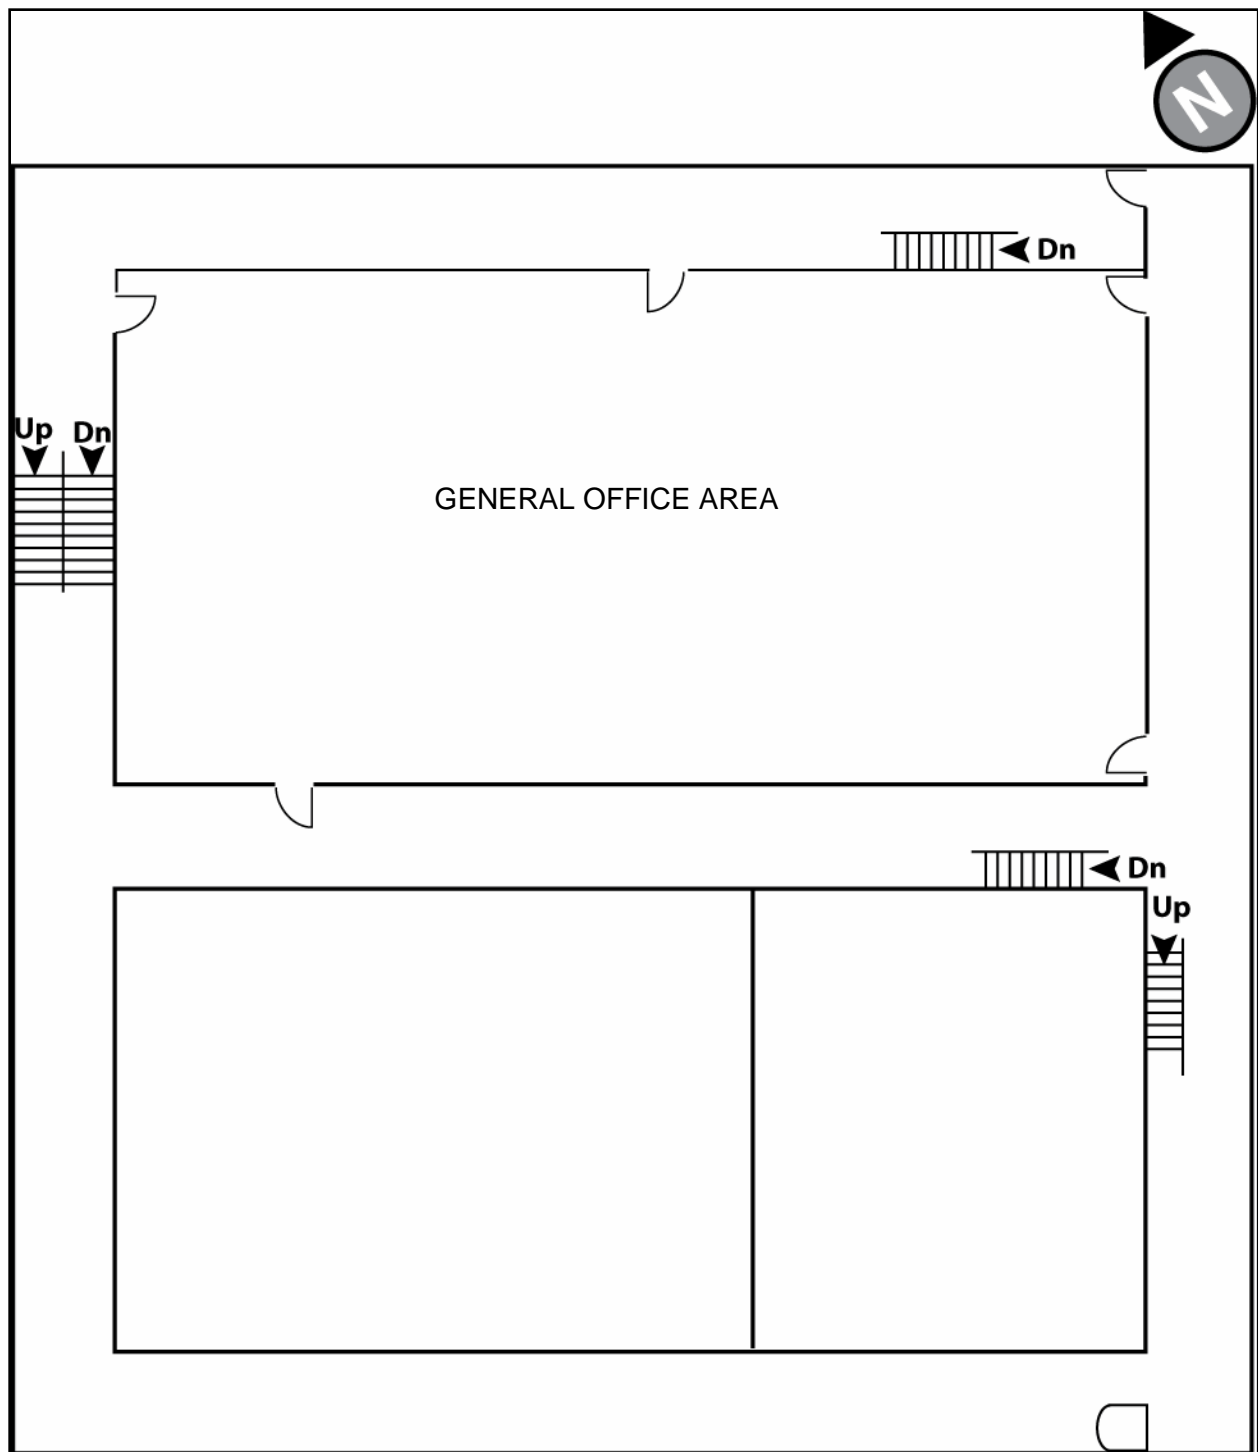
Floor Plan for Building 9825H, Special Projects Building, 2nd Floor
